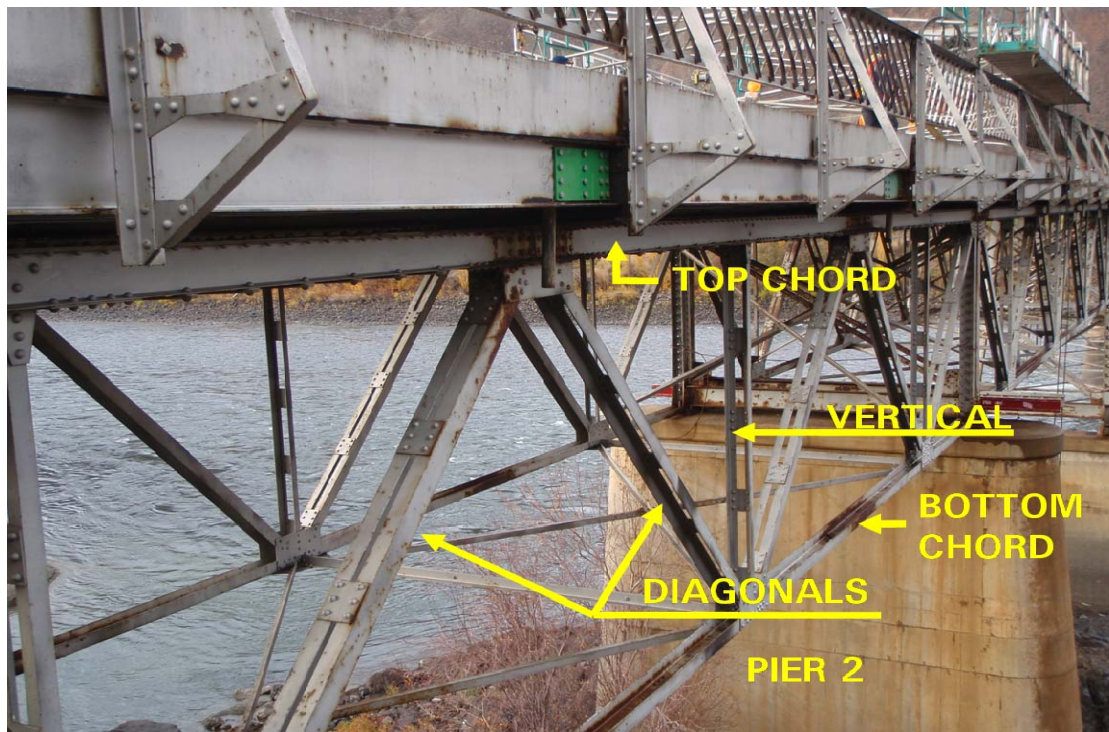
View of Typical Truss Span Showing Vertical Load Carrying Members
